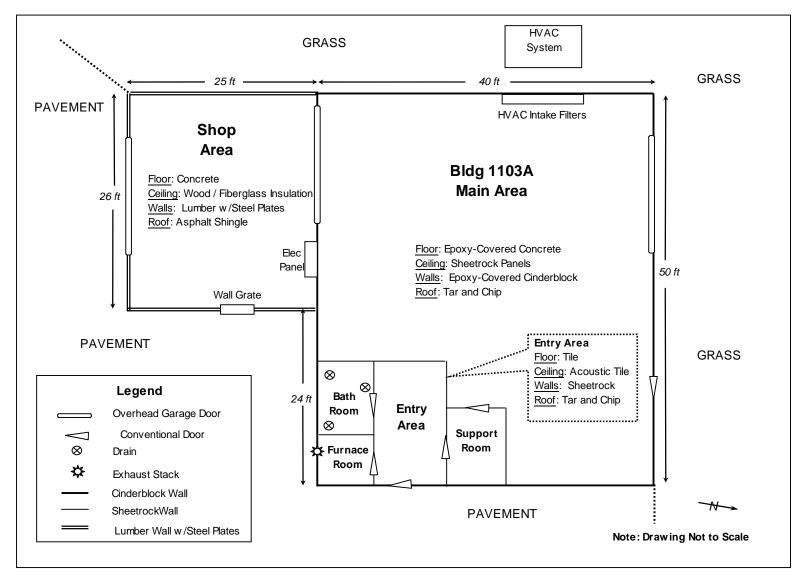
BUILDING 1103A FLOOR PLAN
